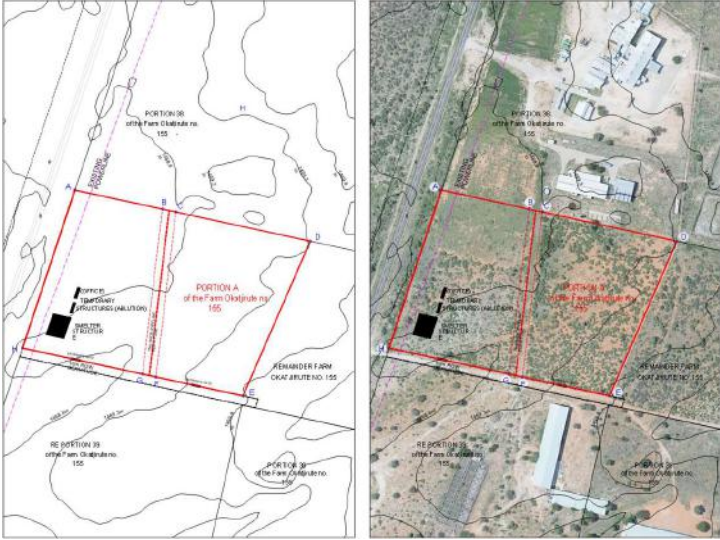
The Site Plan of Witvlei Copper Smelter Plant
